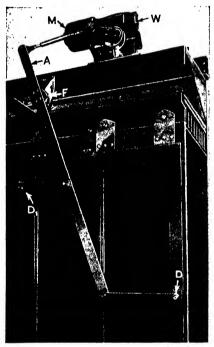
Simple motor-driven operator for opening and closing car doors.
